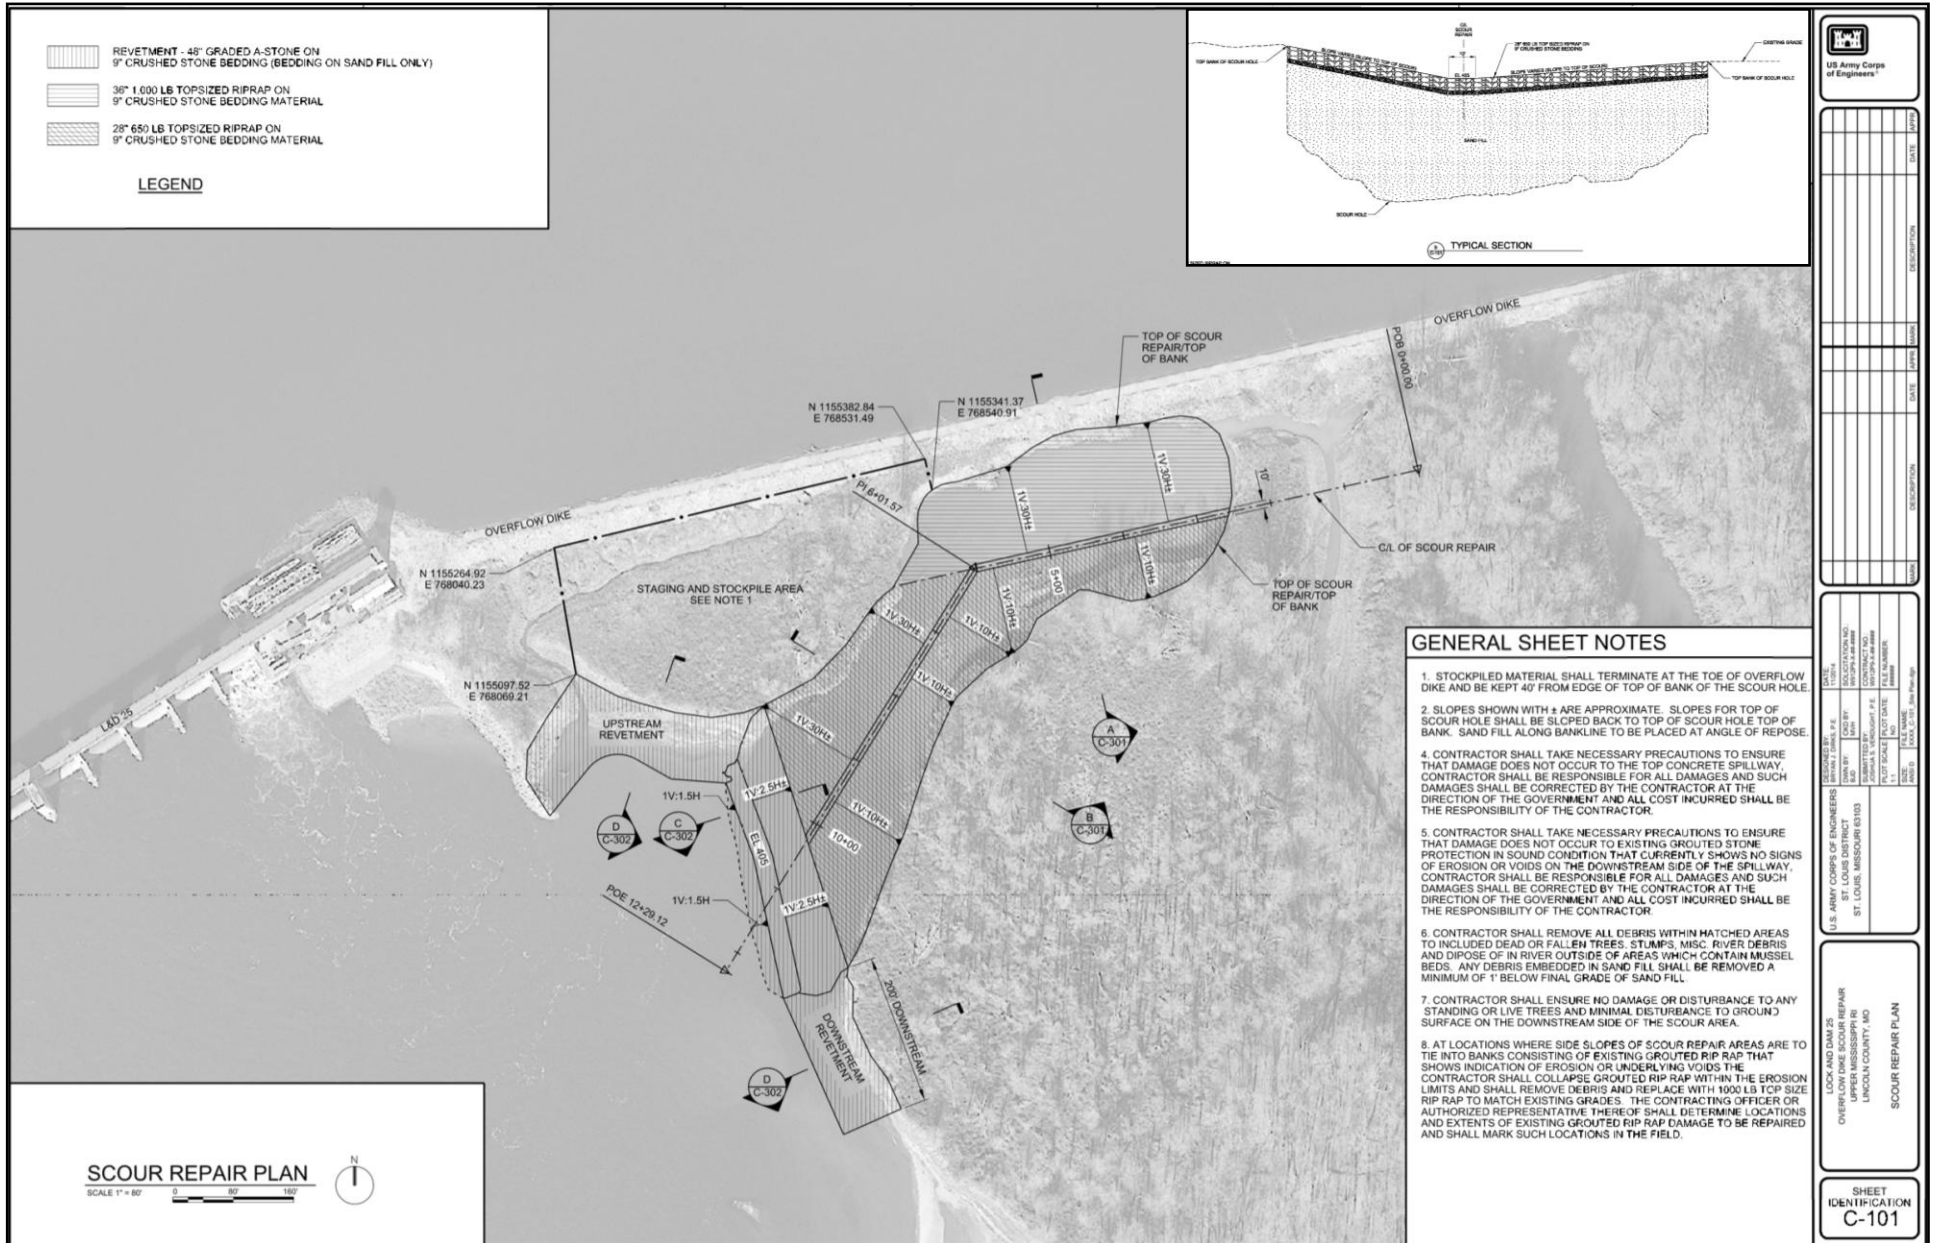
Preliminary drawing of the L&D 25 overflow dike scour IRRM plan, located in Calhoun County, Illinois.
